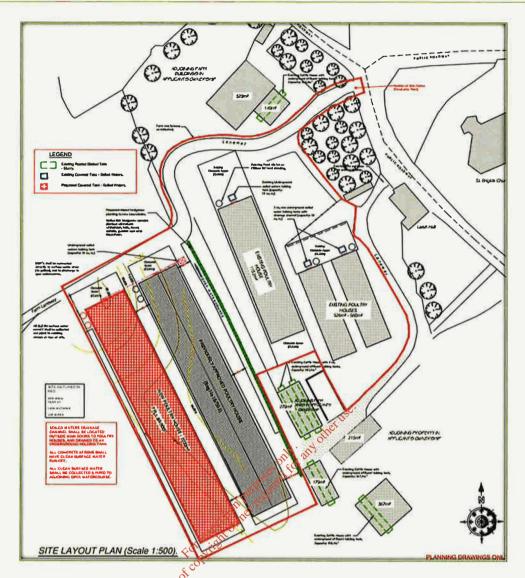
Site Layout Plan (as Prepared by J.M. Johnston)
